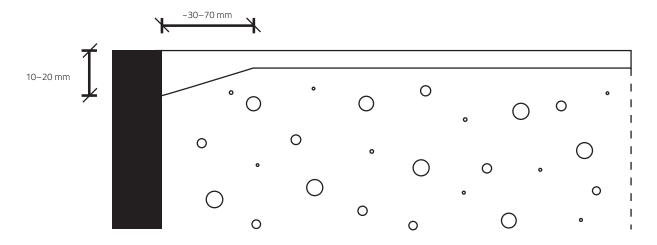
Joining a mass layer to steel structures that protrude above the floor.
